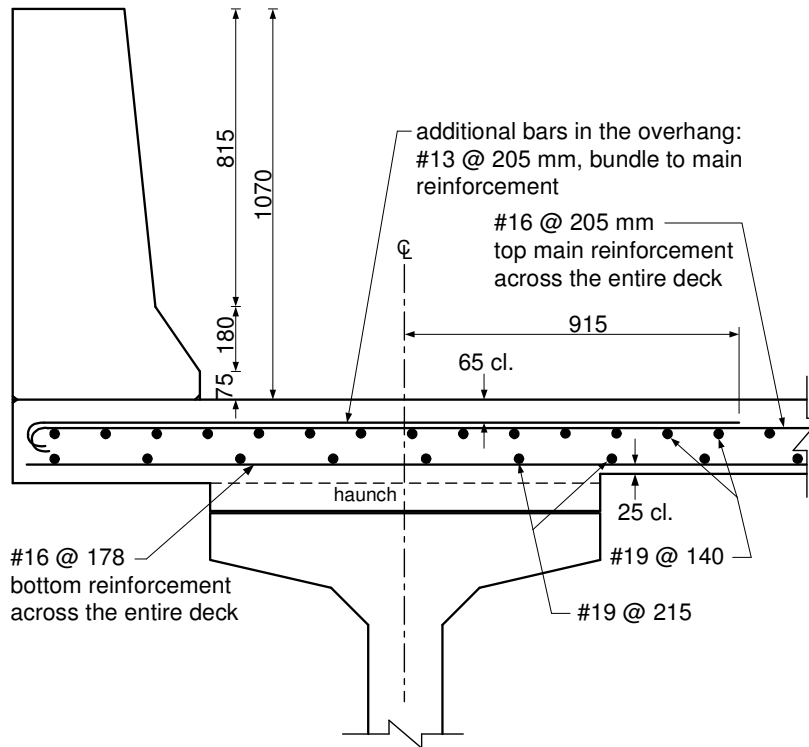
Deck Reinforcement at Intermediate Pier
